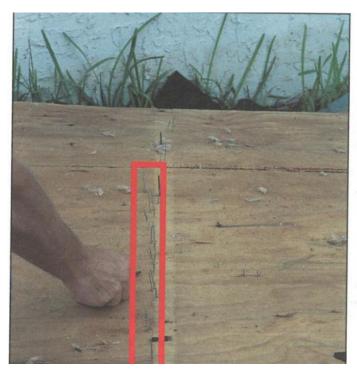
Roof sheathing found in debris. Staples were offline and therefore not connected to supporting truss top chord.
